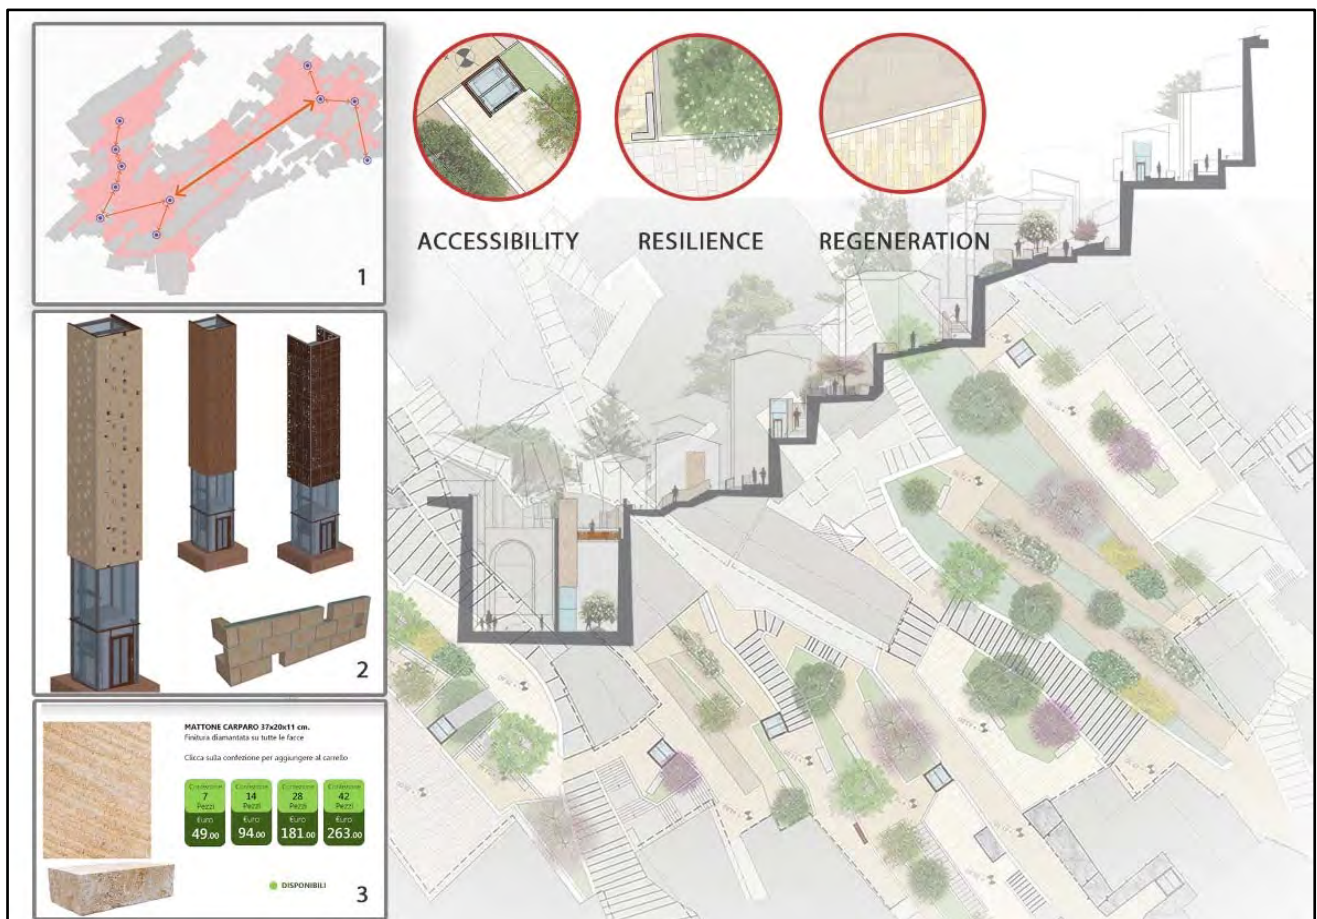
On the left: 1) the design concept, 2) the three options for cladding the ascent hectometric system and 3) the chosen solution. On the right: section of the intervention area 1 (“Case Spallate”) and corresponding plan view with the layout of the public spaces
